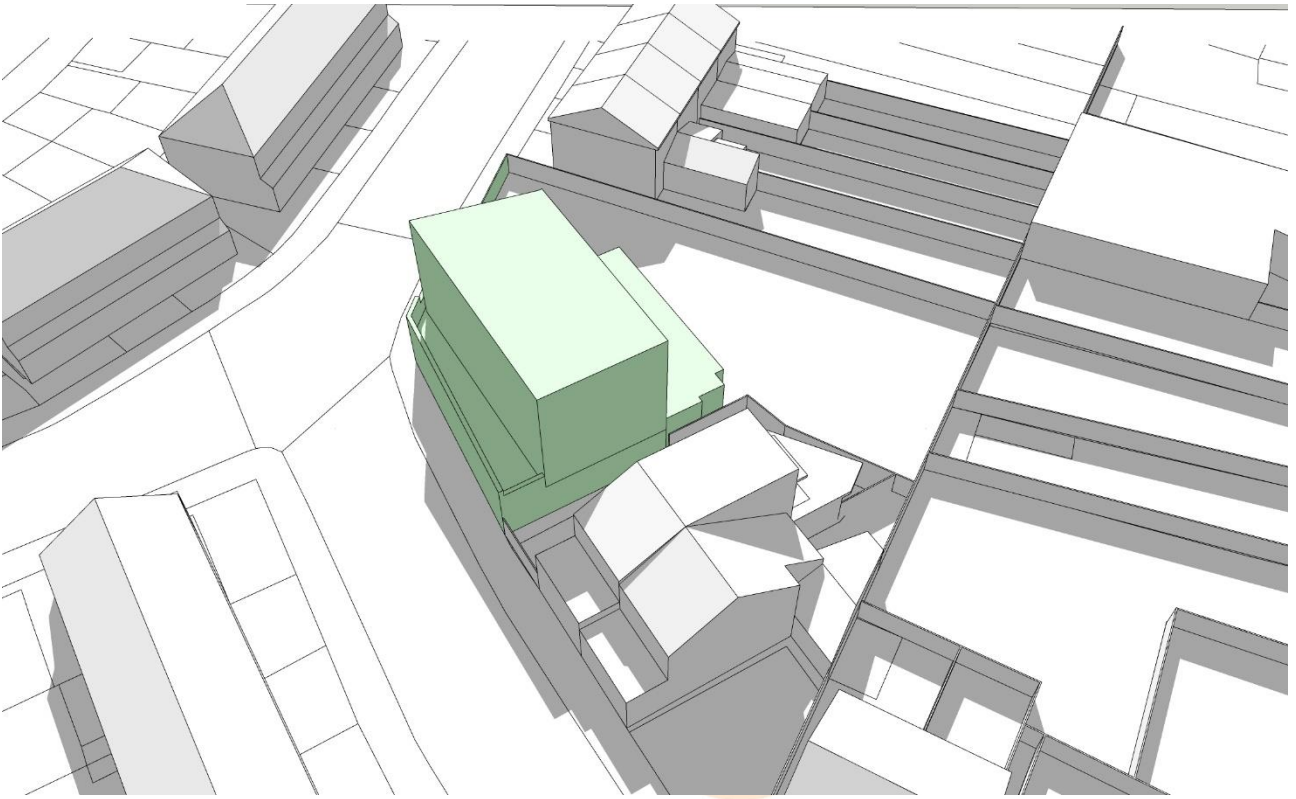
As existing 3D model viewed from North. Shadows set to 12pm, 21st March.
